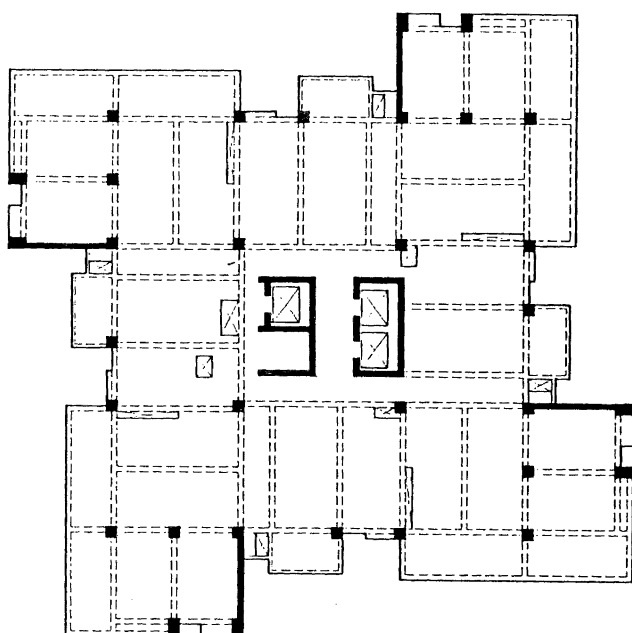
Hyatt Terraces, Baguio - tower plan
